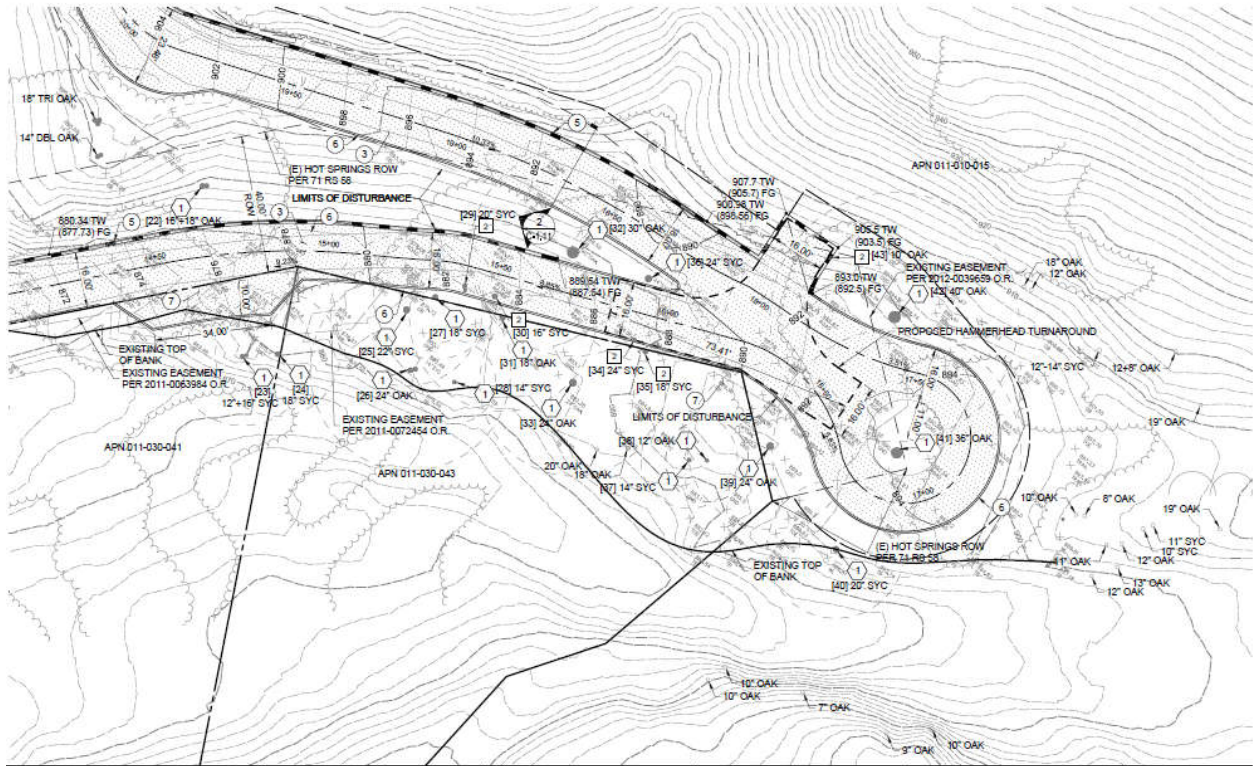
Section C-1.5. The tables on pages 11 and 12 cover both east and west sides of the road without dividing them in two. Section C-1.6 overlaps this section and begins with tree #s 42 and 43.
